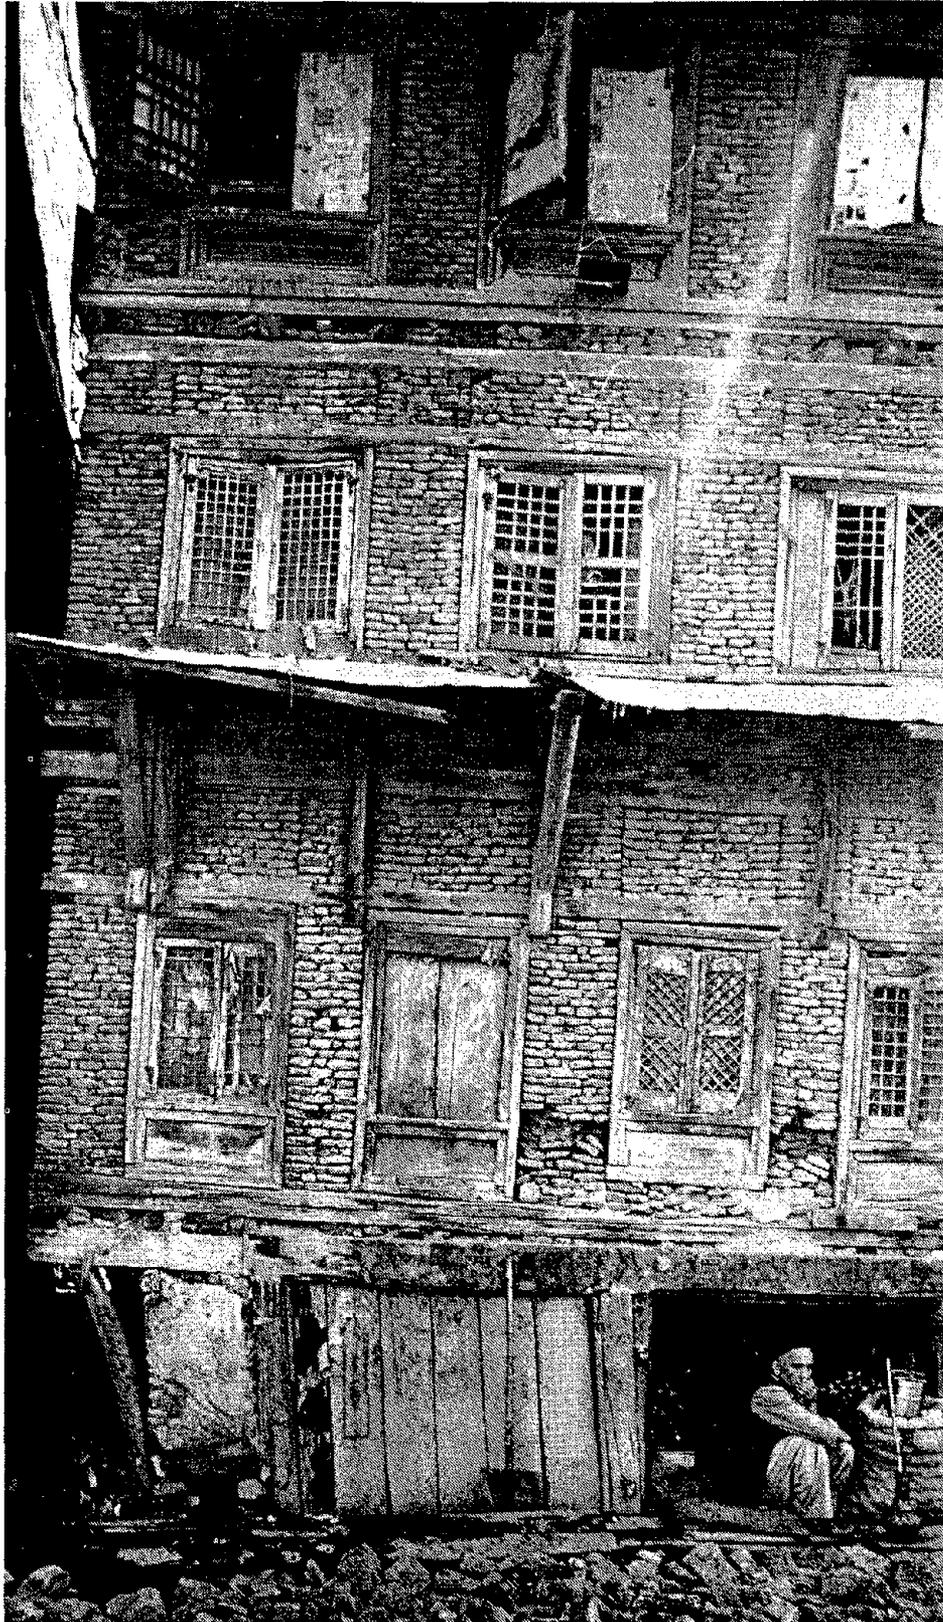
A BUILDING IN SRINAGAR, KASHMIR WHICH HAS SURVIVED MANY EARTHQUAKES BECAUSE OF ITS TIMBER RUNNER BEAMS. The ends of the floor joists can be seen penetrating the wall between the horizontal beams. There are no vertical supports in the masonry wall.
